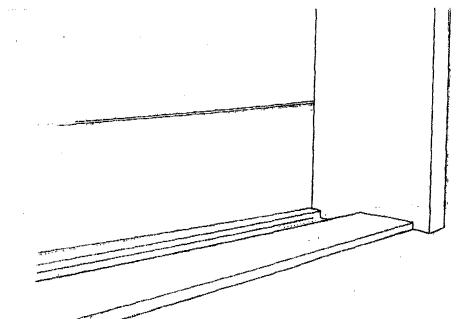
Detail of drain in boys' urinal, splash wall plastered to 1 metre
